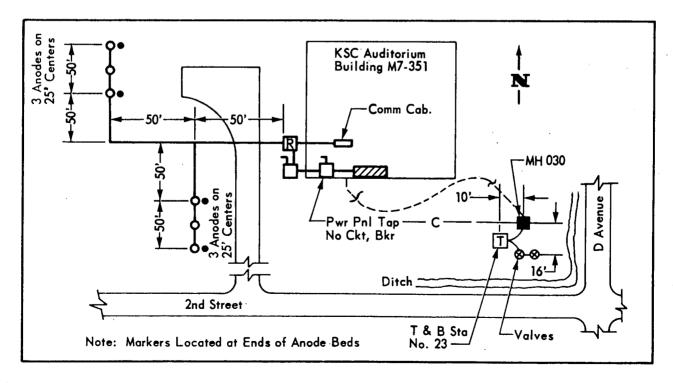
Site No. 28 and Test and Bond Station No. 23
